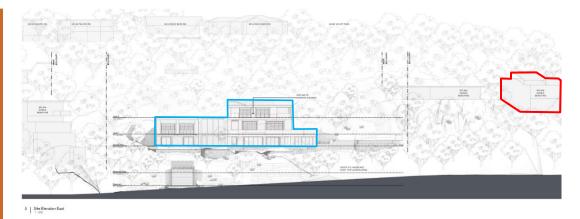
Site elevation east in relation to surrounding built environment, proposed residence indicated in blue, heritage item Cox House (item no. 2270014) indicated in red, Excerpt from Site Section & Site Elevation (Source: Drawing No. 0200, Rev. A)
